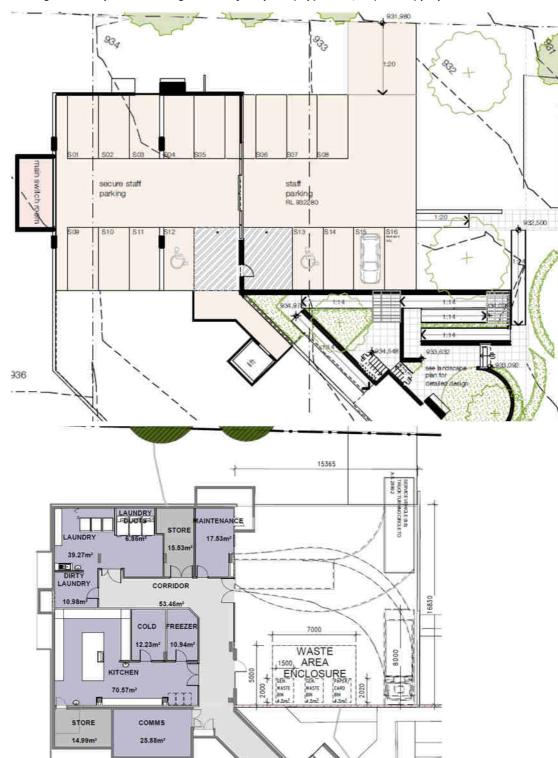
Comparison Building A Ground floor plans (top) DA228/15 (bottom) proposed.
